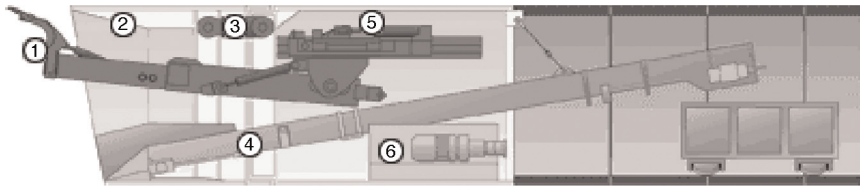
Shield with a partial-face excavator: 1, excavator; 2, shield; 3, steering cylinder; 4, conveyor belt; 5, machine pipe; 6, hydraulic power pack (courtesy of Herrenknecht AG)
